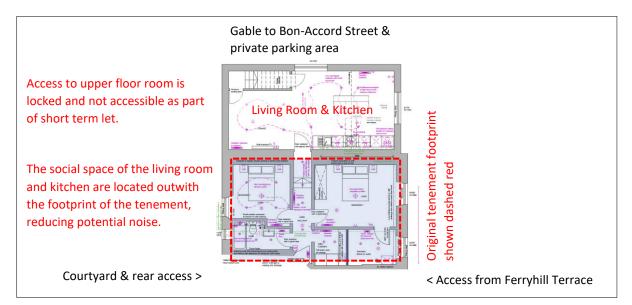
General flat layout with ground floor access to short term let and social spaces outwith tenement footprint
